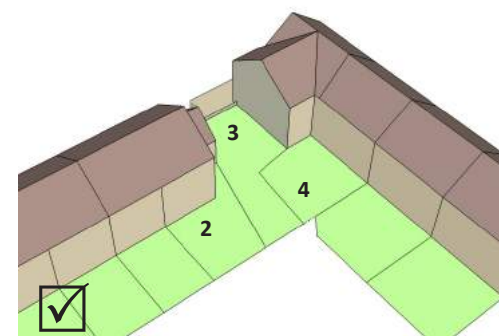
By extending plot 3 to turn the corner and setting back plot 2 it provides sufficient space for a garden. By providing plot 2 with a single storey element and an adjoining brick wall, it further assists with maintaining a built frontage
